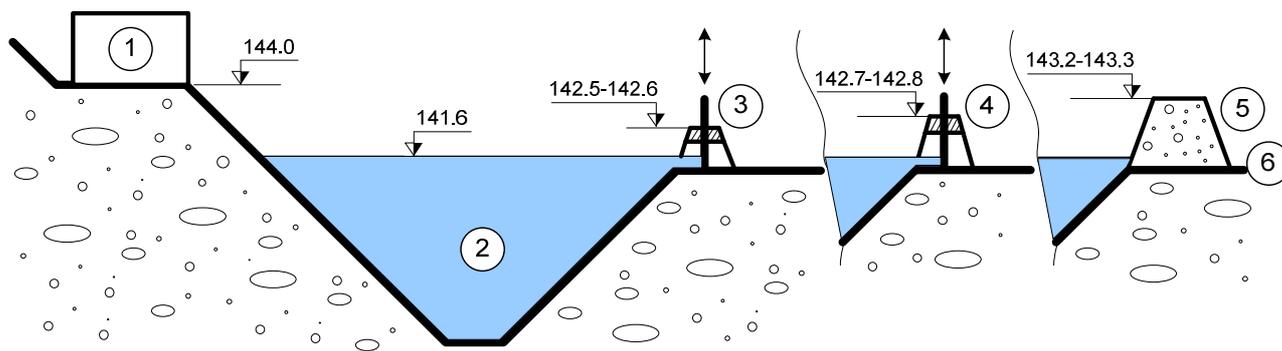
Levels of Lake Drūkšiai and hydro-engineering structures
